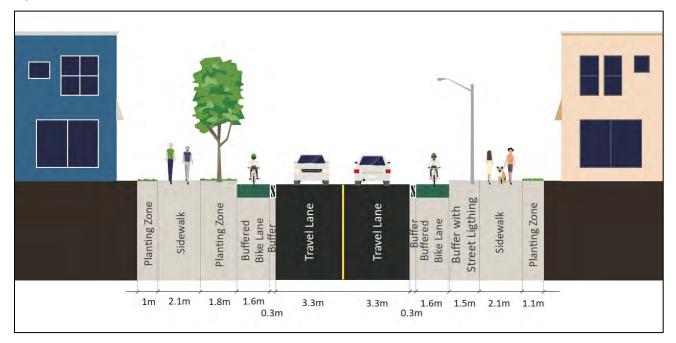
Potential Cummer Avenue Cross Section - Interim Condition
